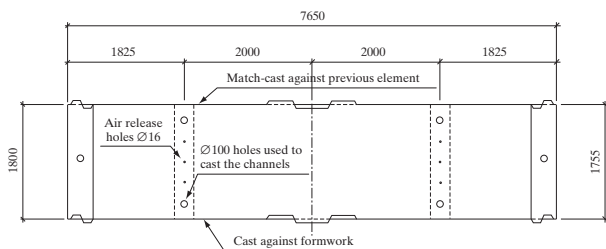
Plan of a prefabricated bridge deck element (Units: mm)
